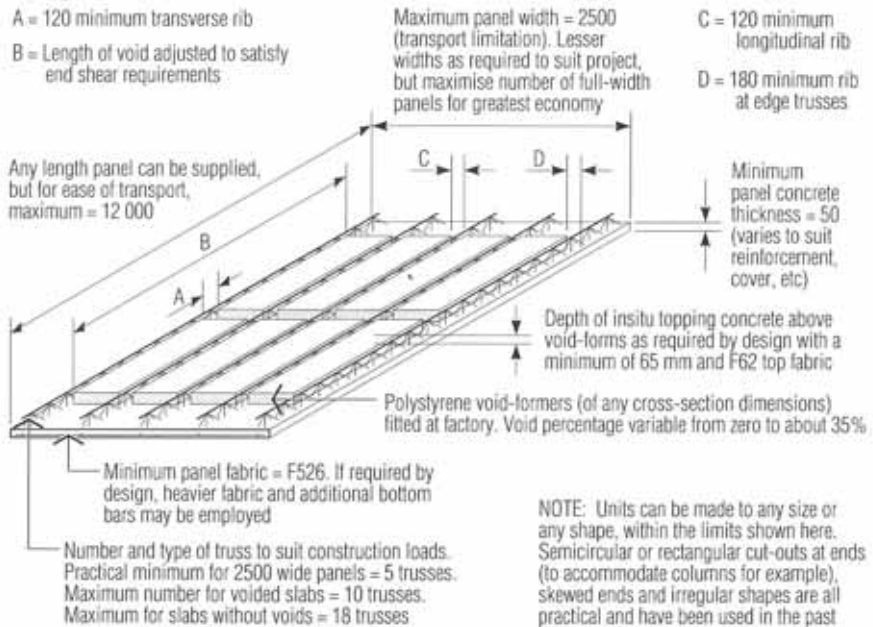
TYPICAL PERMANENT FORMWORK UNIT ARRANGEMENT
